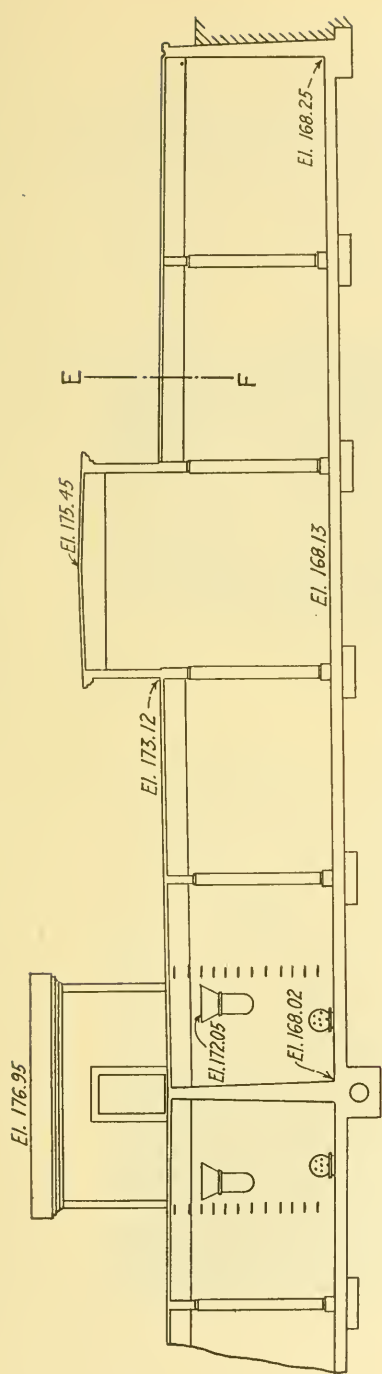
CROSS-SECTION ON LINE AB (FIG. 1).
